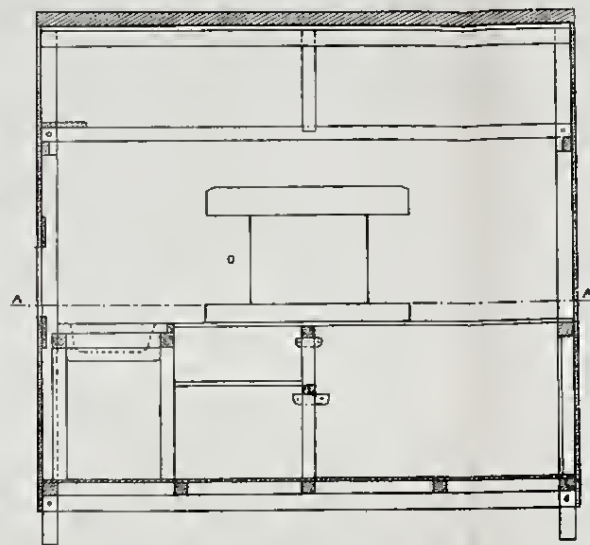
SECTIONAL ELEVATION THROUGH BB.
